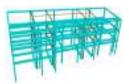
3D view for model distress reinforced concrete building frame with retrofit frame
